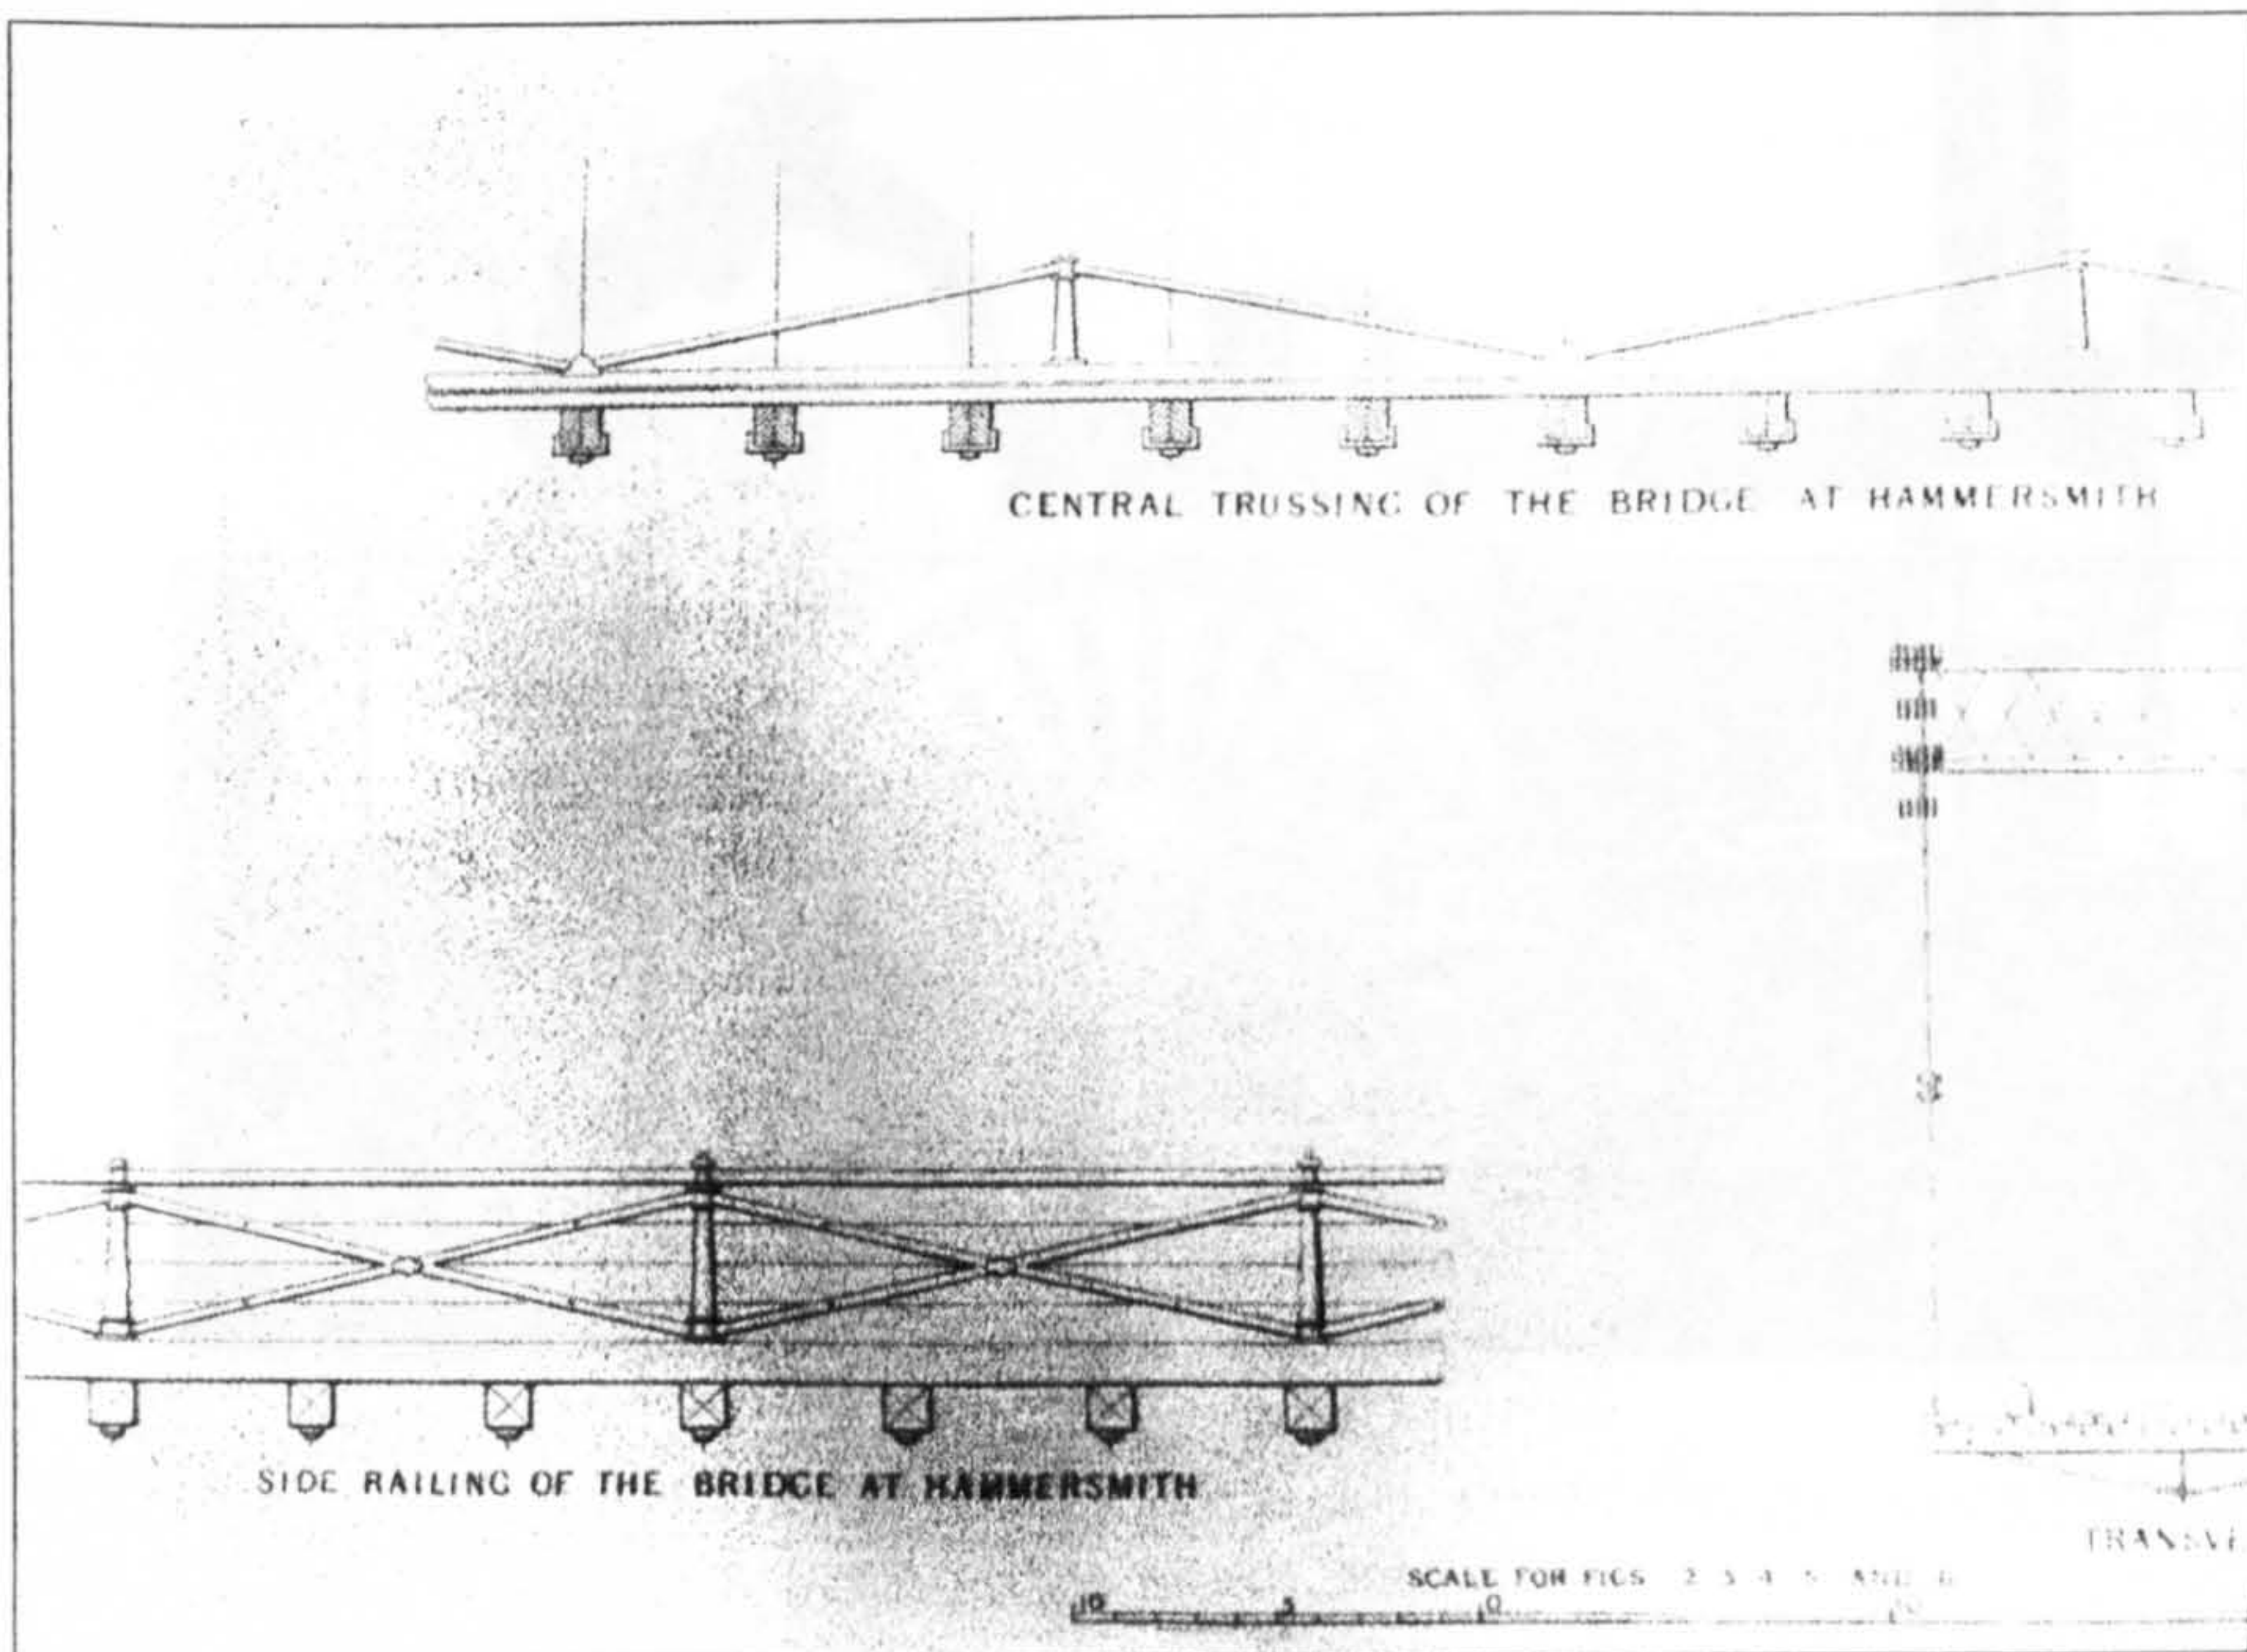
B Hammersmith Bridge 1827. Side and central trussing.
